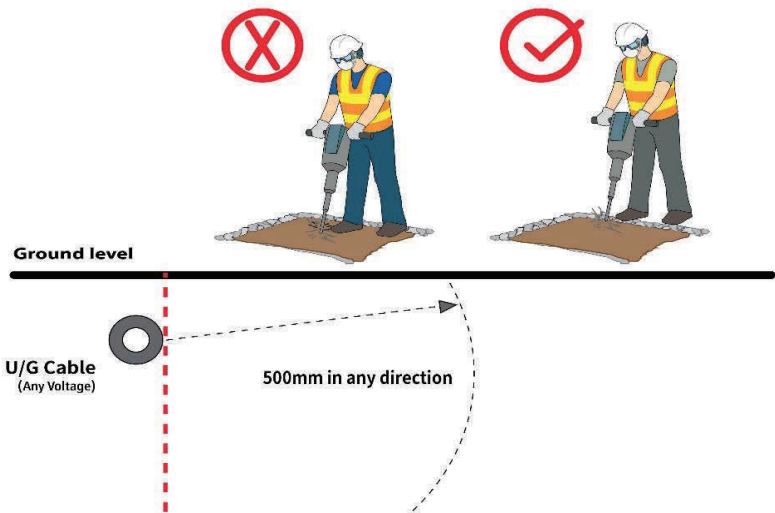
Minimum safe working distance between any U/G cable and the point where hand-held power tools are used for excavation
